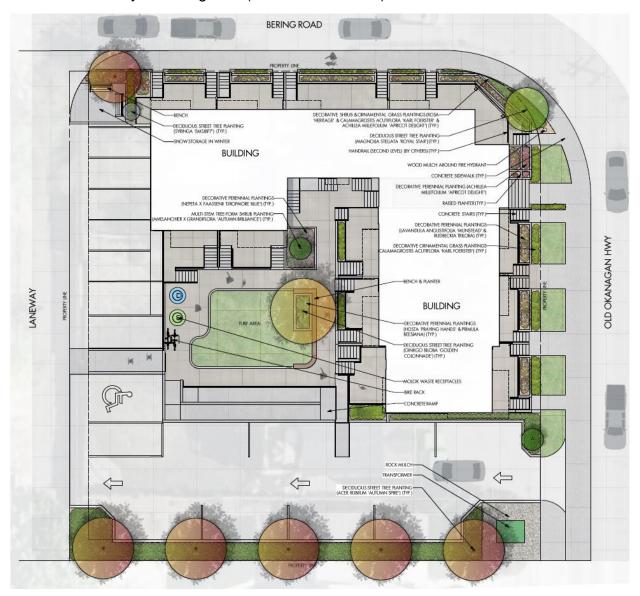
Site plan showing landscaping and designated pedestrian accesses to the site.
